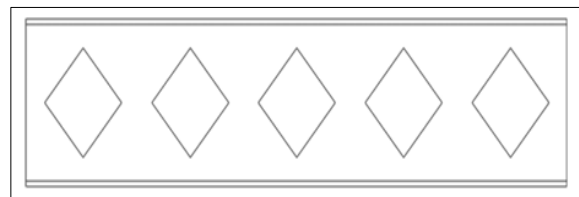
Castellated Beam with Diamond-Shaped Opening
